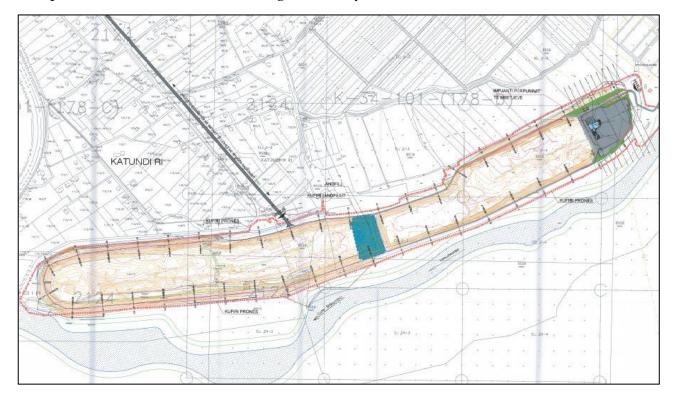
15 Construction site layout of Waste Treatment Plant in Elbasan
